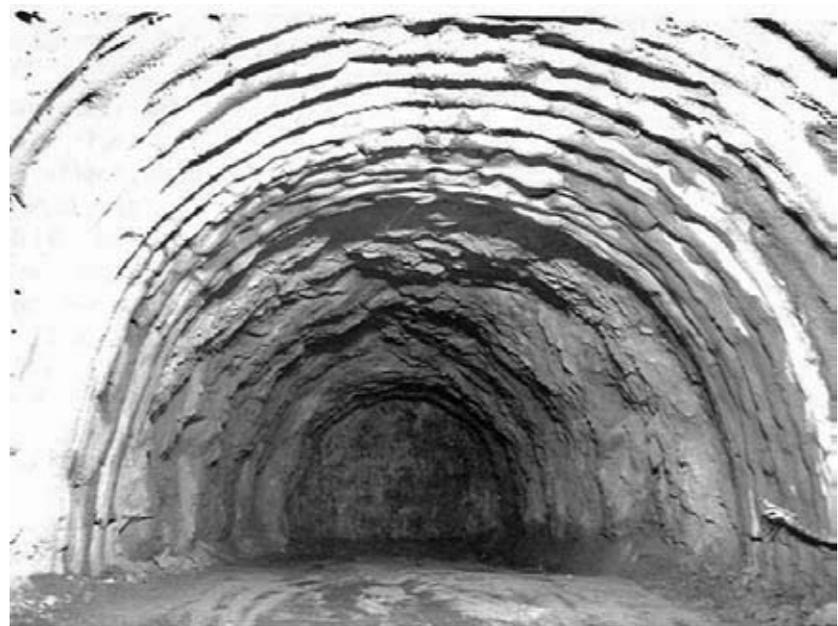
Overprofiled (overbreak) tunnel excavation and tunnel supporting by tunneling in karst (Source: TUNEL MALA KAPELA – NAJDUŽI TUNEL U HRVATSKOJ), GRAĐEVINAR 56 (2004) 1)
